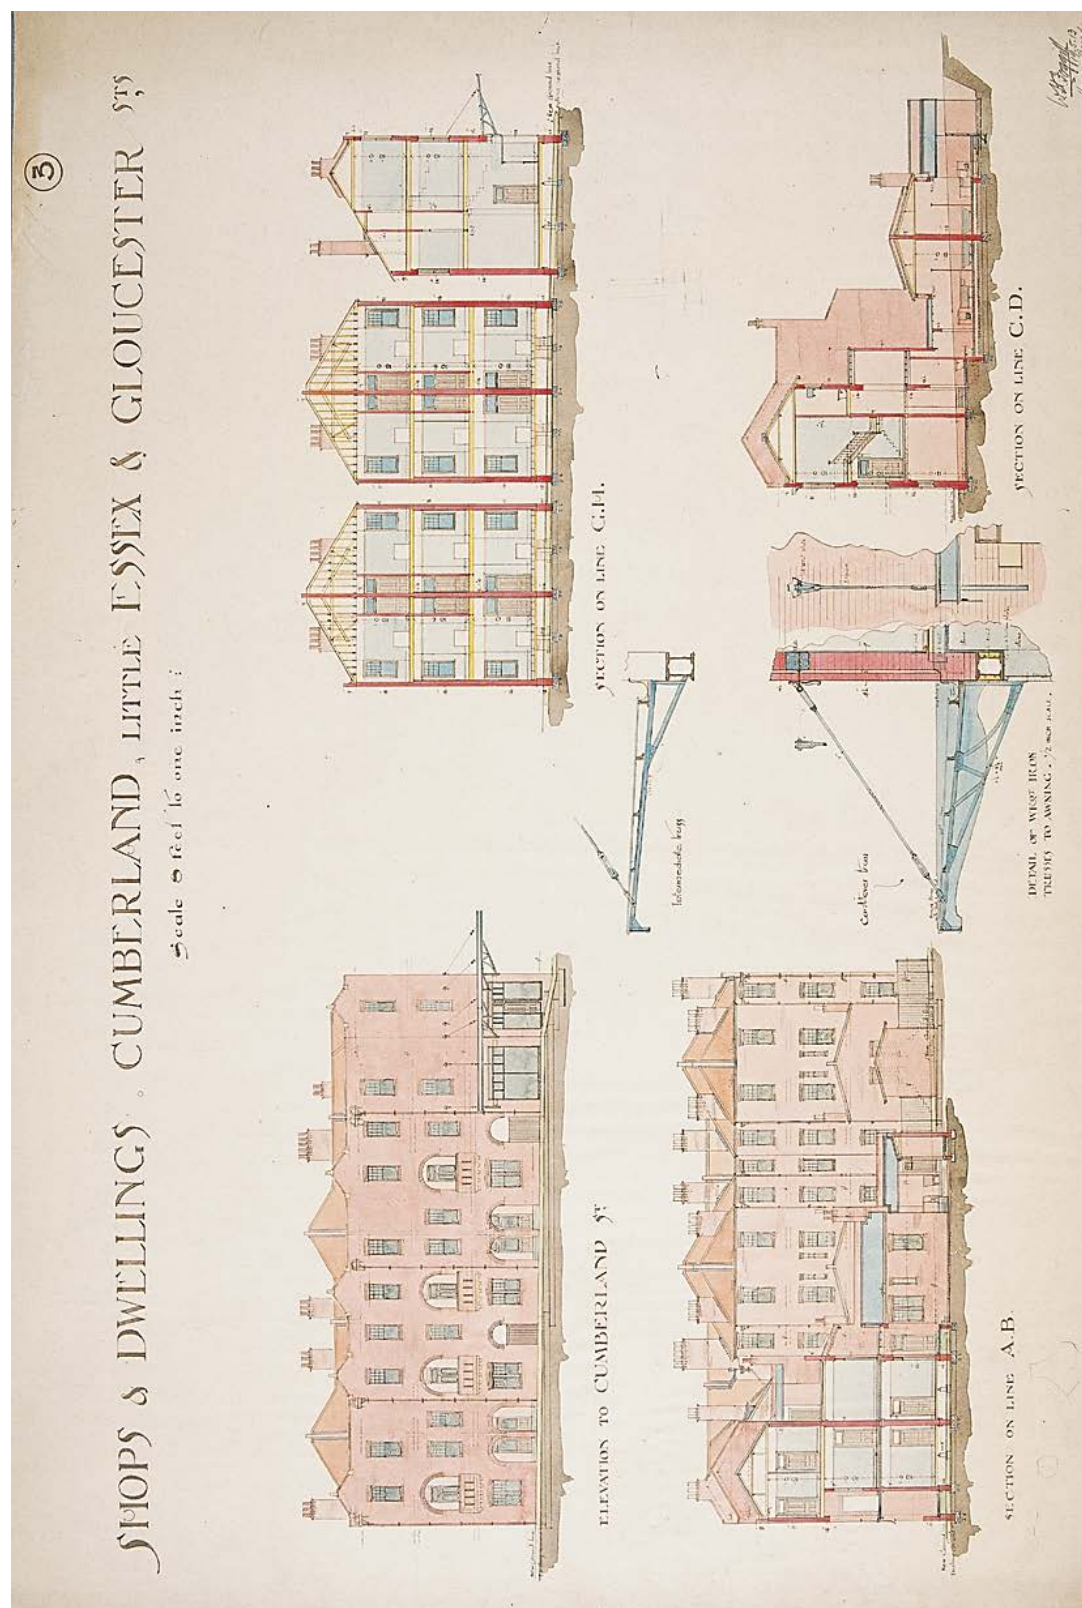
Cumberland Street elevations, section and details for Shops & Dwellings, Cumberland, Little Essex & Gloucester Streets, The Rocks, Housing Board, Architect Foggitt dated May 1913, Source: State Records NSW, Plan No. 3134
